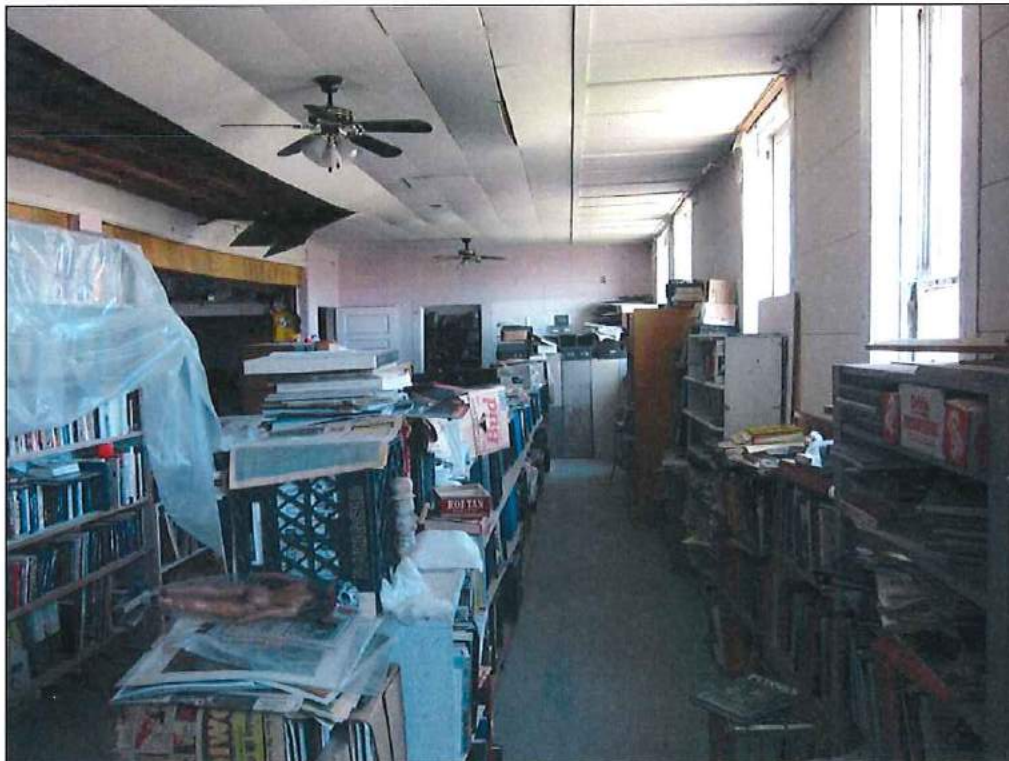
of 16: Showing the separated space to the north of meeting hall, looking west, August 2010
